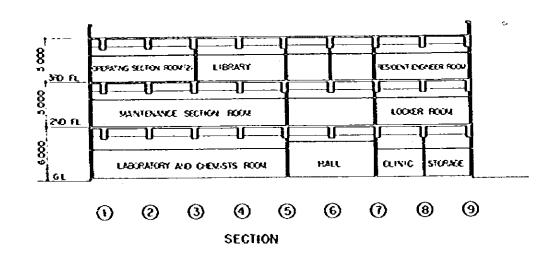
ADMINISTRATION BUILDING ELEVATION AND SECTION
